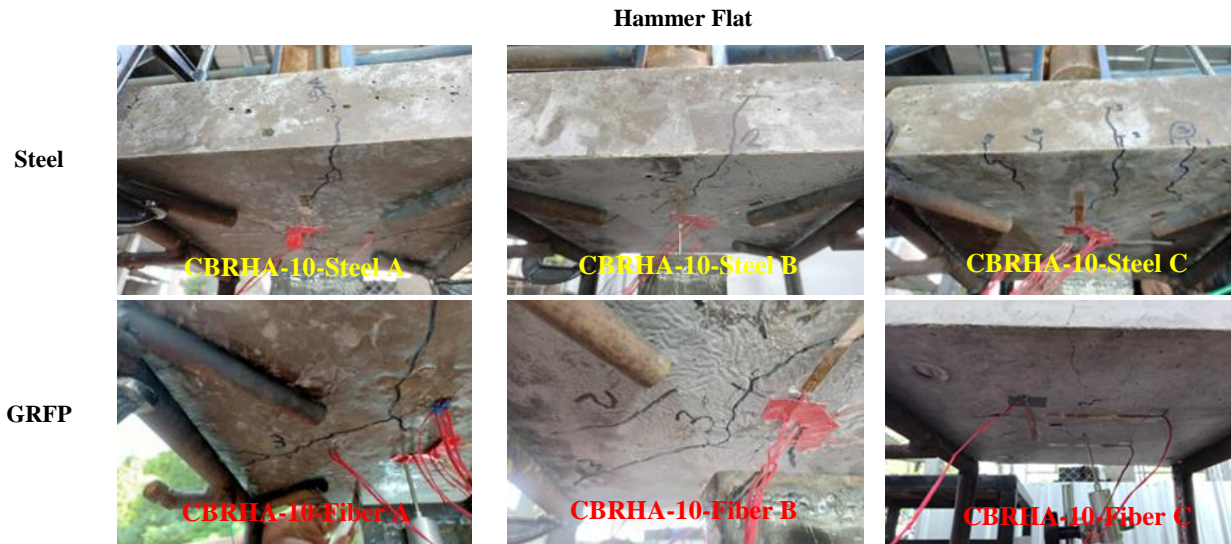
The damage patterns from impact on bio-steel and fiber-reinforced concrete using a flat hammer head
